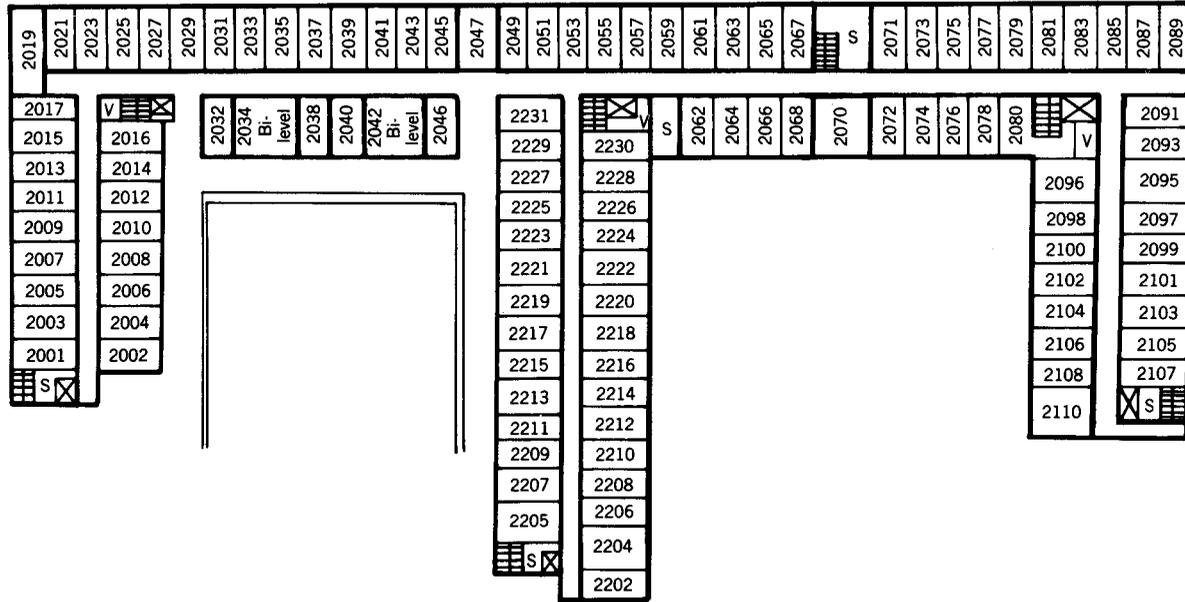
Floor plan layout of the model hotel; 114 second-floor rooms.
